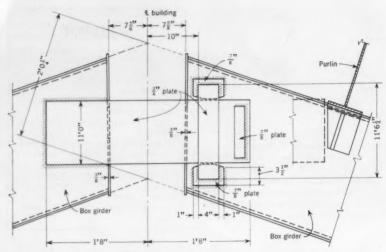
Each half of the main supporting roof frame acts independently. Under maximum load the ridge can deflect a total of 22 in., at which point the ends of the main girders meet.
